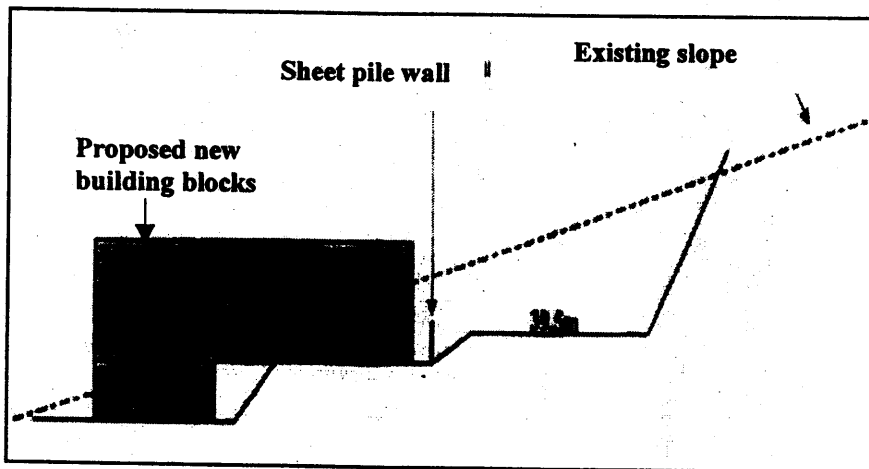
Installation of sheet piles at the toe of the slope between platforms at 37.6m and 39.5m.
